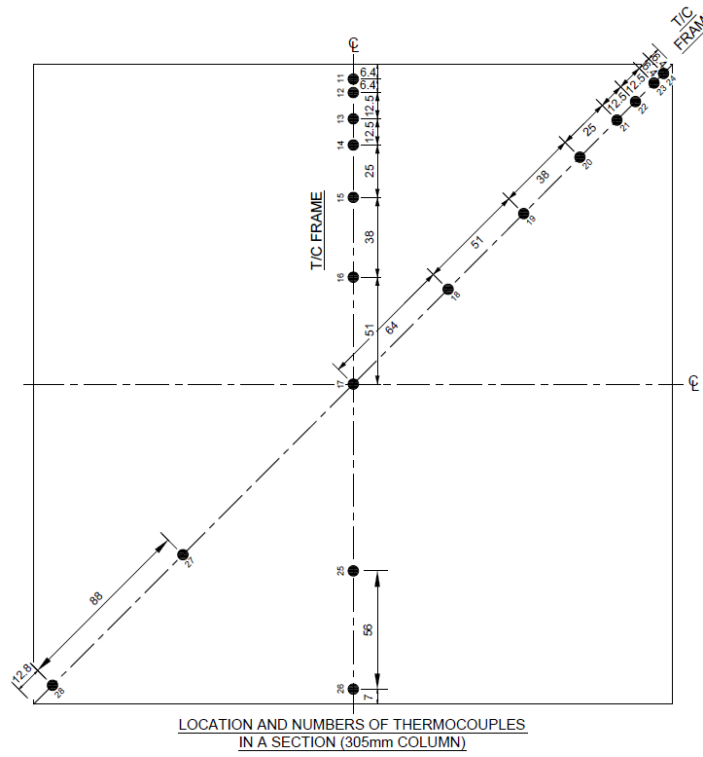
Columns' Cross-Section and Location of Thermocouples.
